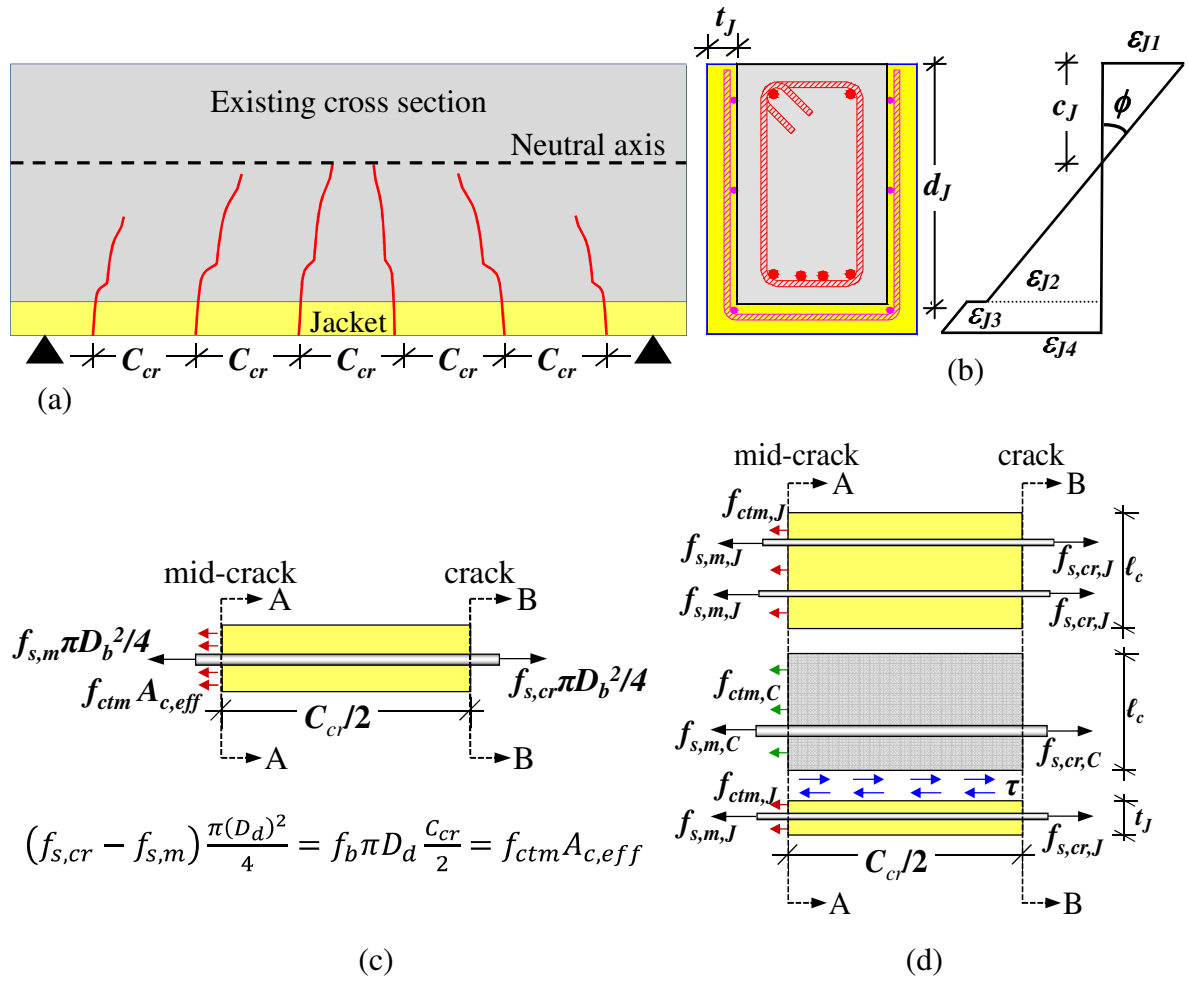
(a) Definition of crack spacing,  $C_{cr}$ , at crack stabilization. (b) Strain profile of the jacketed cross section. (c) Bar stresses at mid-distance between cracks (section A-A) and at crack (section B-B). (d) Free body equilibrium in the tension zone of the core of the composite section at sections A-A and B-B.
